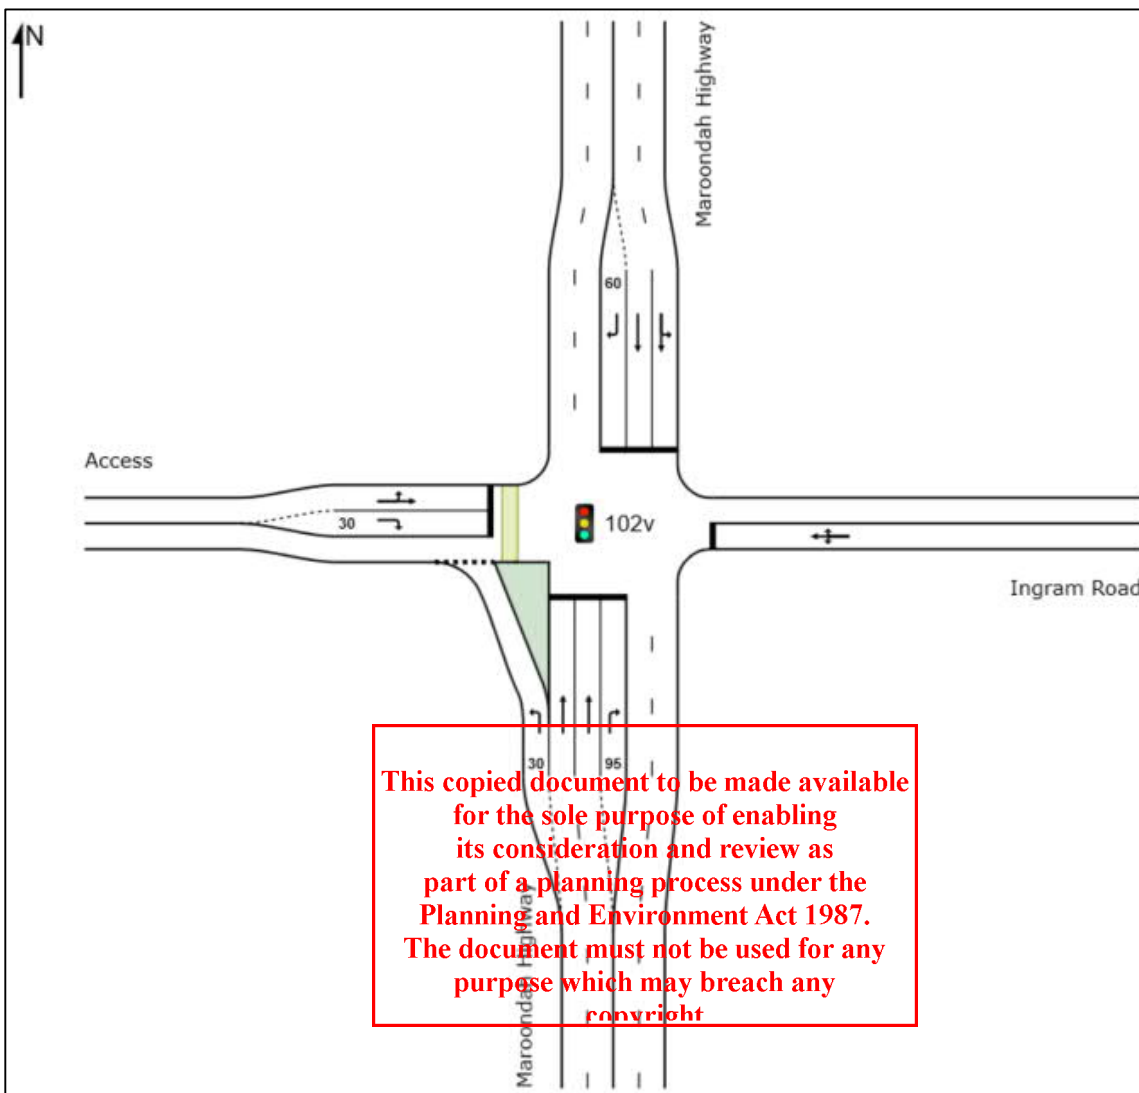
SIDRA layout for the Maroondah Highway/ Ingram Road/ New access road intersection for Scenario 3 (ultimate layout)
